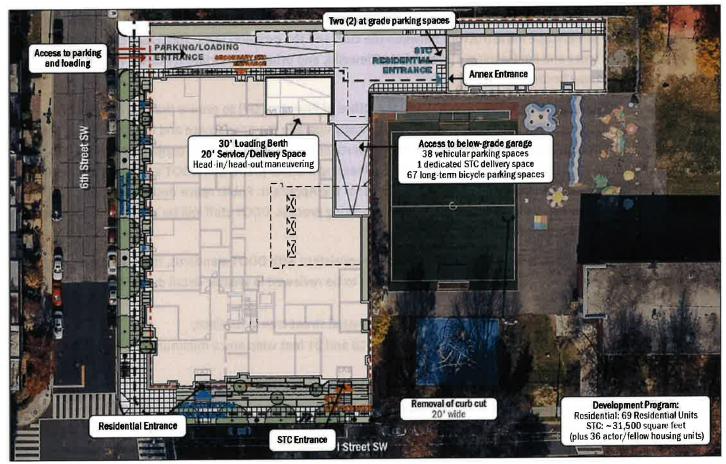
Site Plan (Source: CTR, Gorove/Slade, Figure 5, 12/3/18)
